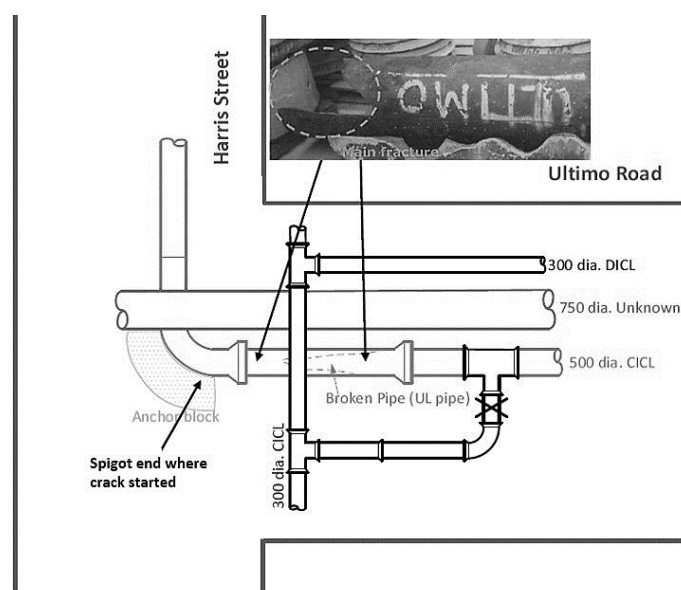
17 Layout of failed pipe section and adjacent pipes
